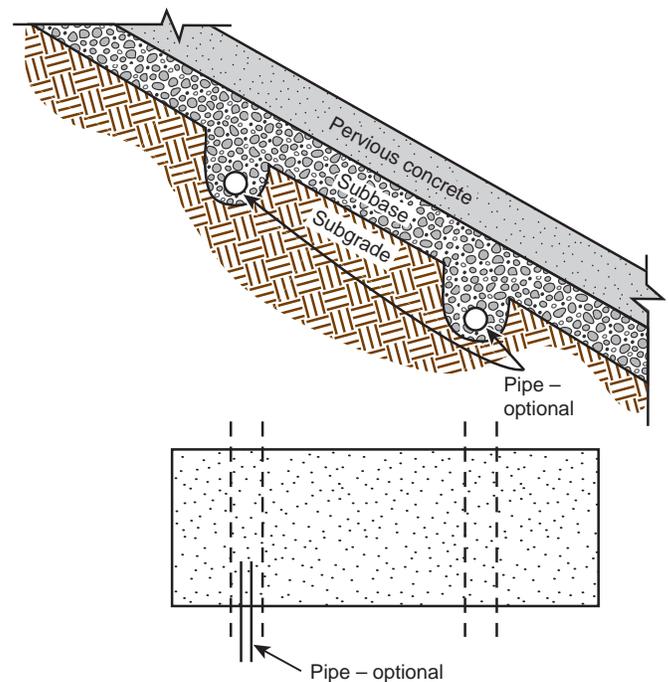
Elevation (top) and plan (bottom) views of a sloped installation. For sloped pervious concrete pavements, storage capacity calculations must consider the depth of pavement, infiltration rate of subbase, and desired runoff goals. Source: Tennis, et al, 2004.
